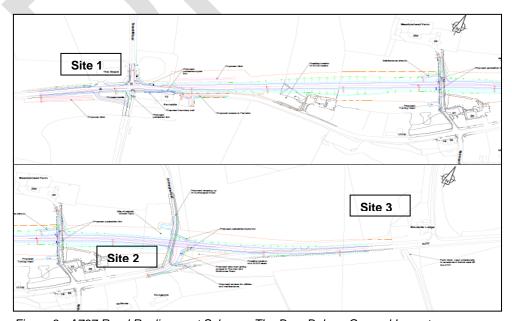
A737 Road Realignment Scheme, The Den, Dalry – General Layout
